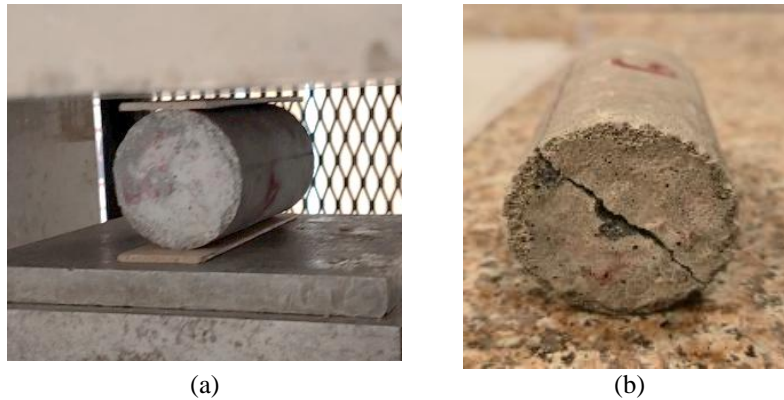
Concrete samples after split tensile strength test (a) Concrete samples before testing, (b) Concrete samples after splitting
